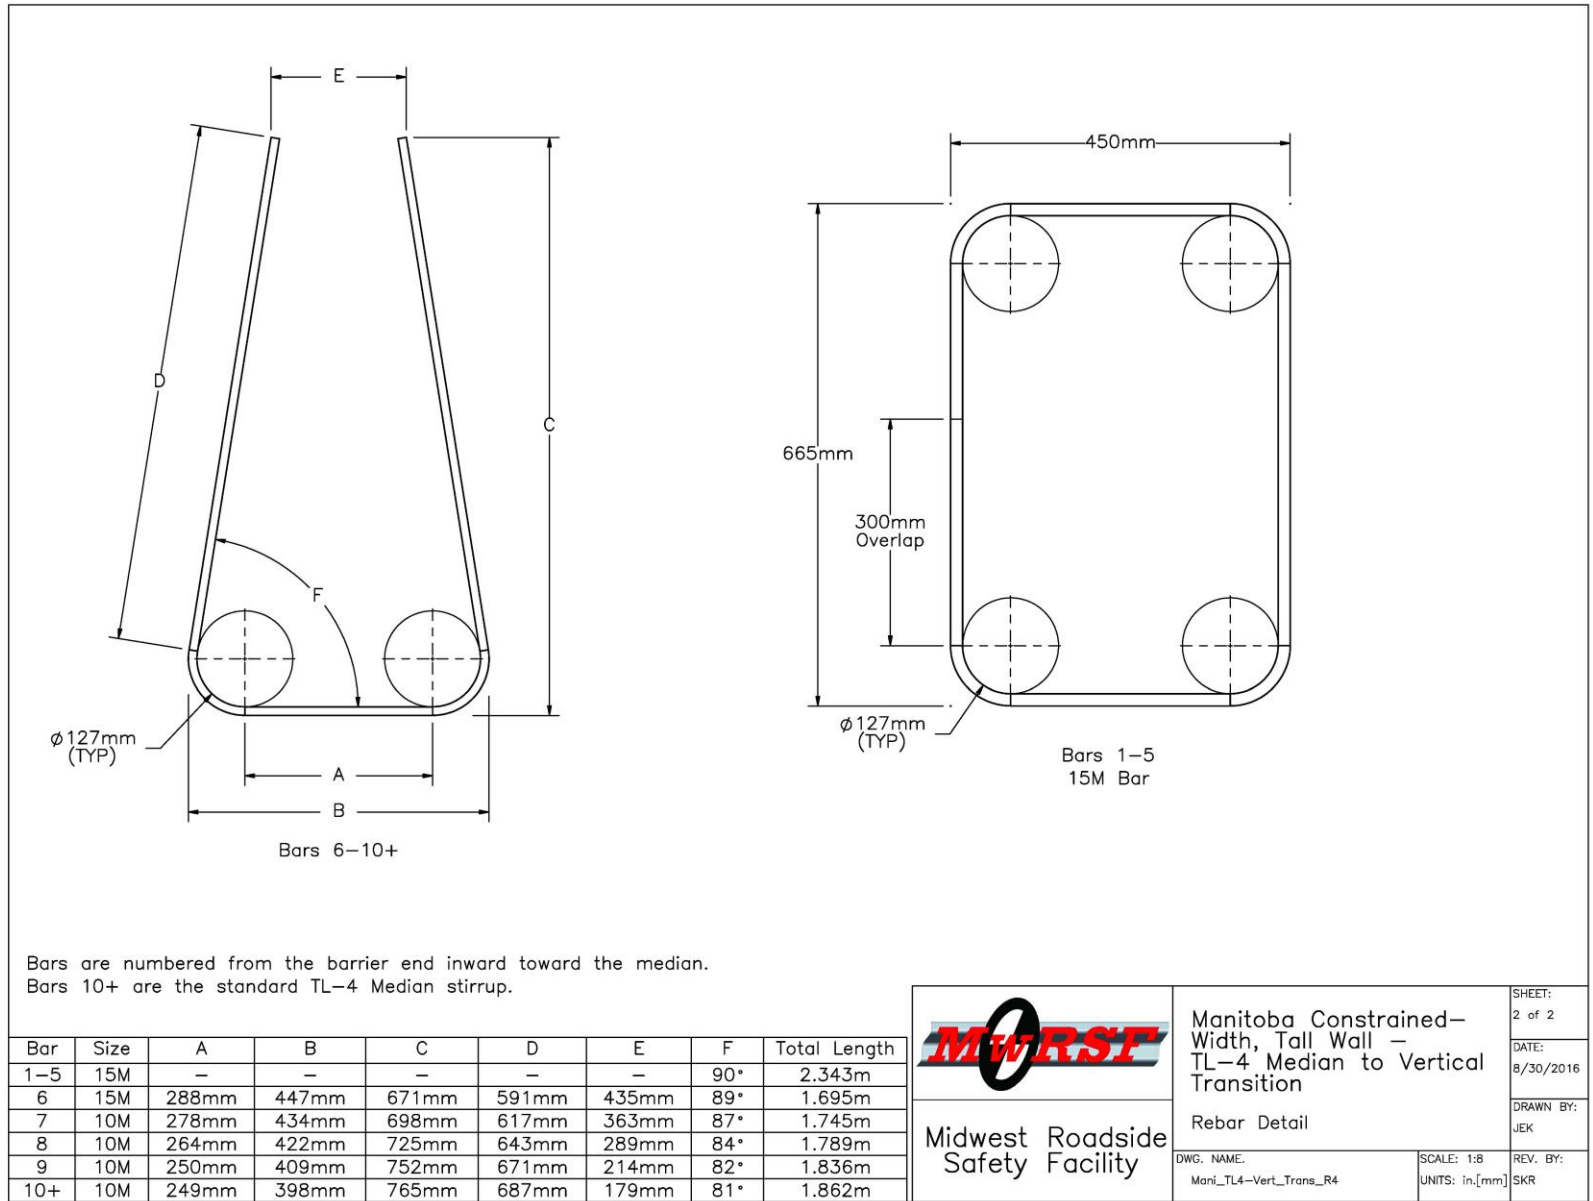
Transition Details, TL-4 Median Barrier to Vertical Parapet
